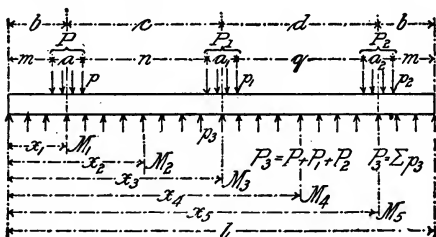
Diagram of Combined Footing, Three Unequally Loaded Columns, Area Rectangular.
